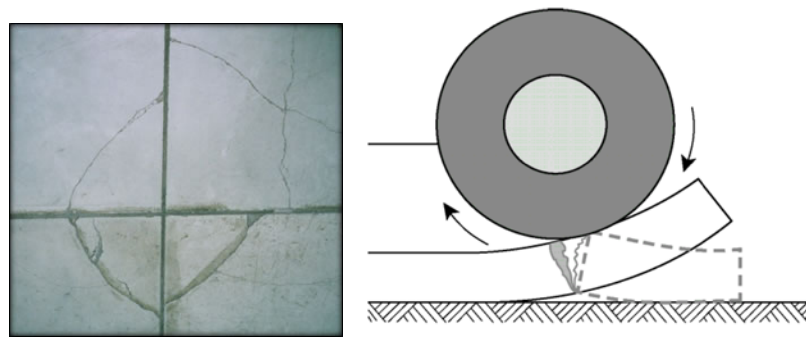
Cracking of the concrete slab corners due to lift-off and passing traffic load.
